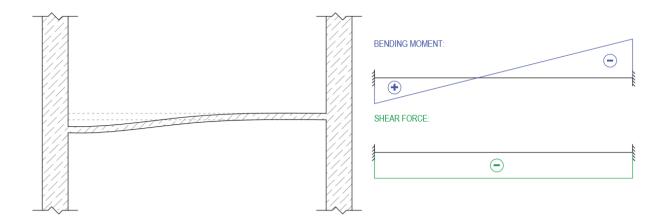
Schematic illustration of differential shortening and internal forces
